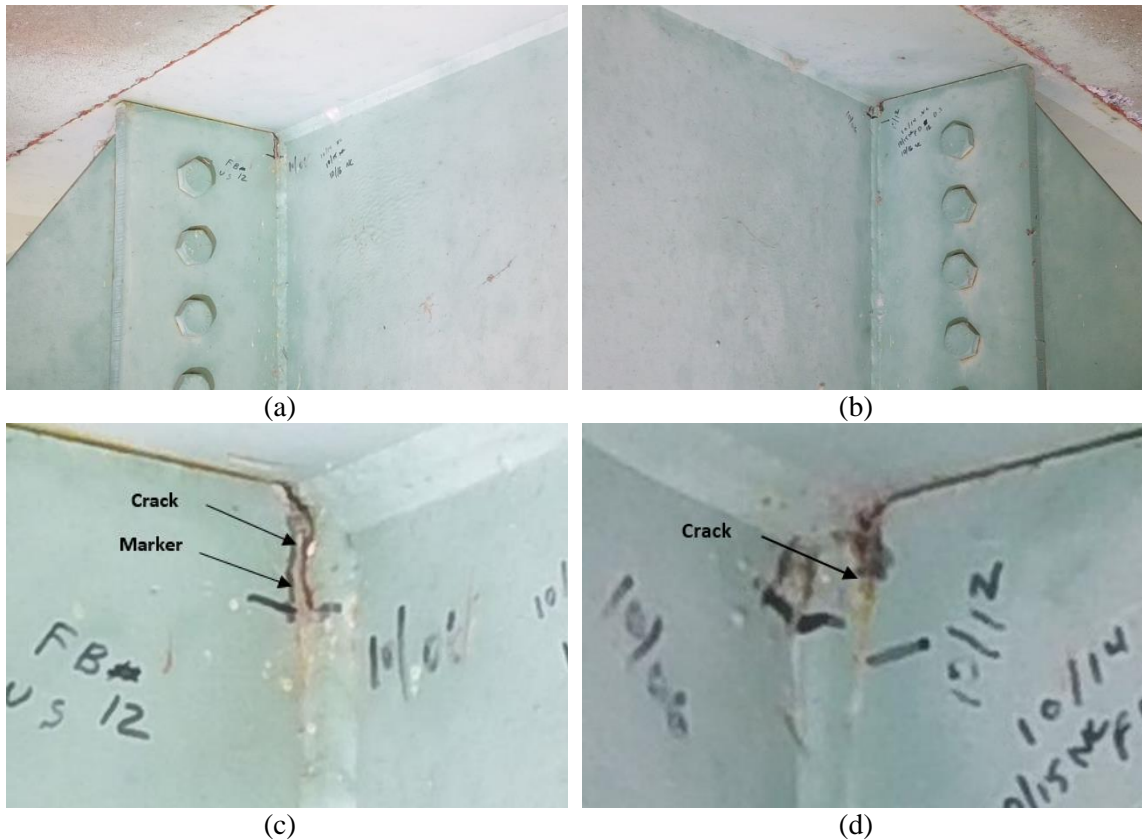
Inspection images from Fall River Bridge points (a) 11 and (b) 12; and magnified inspection images from points (c) 11 and (d) 12
